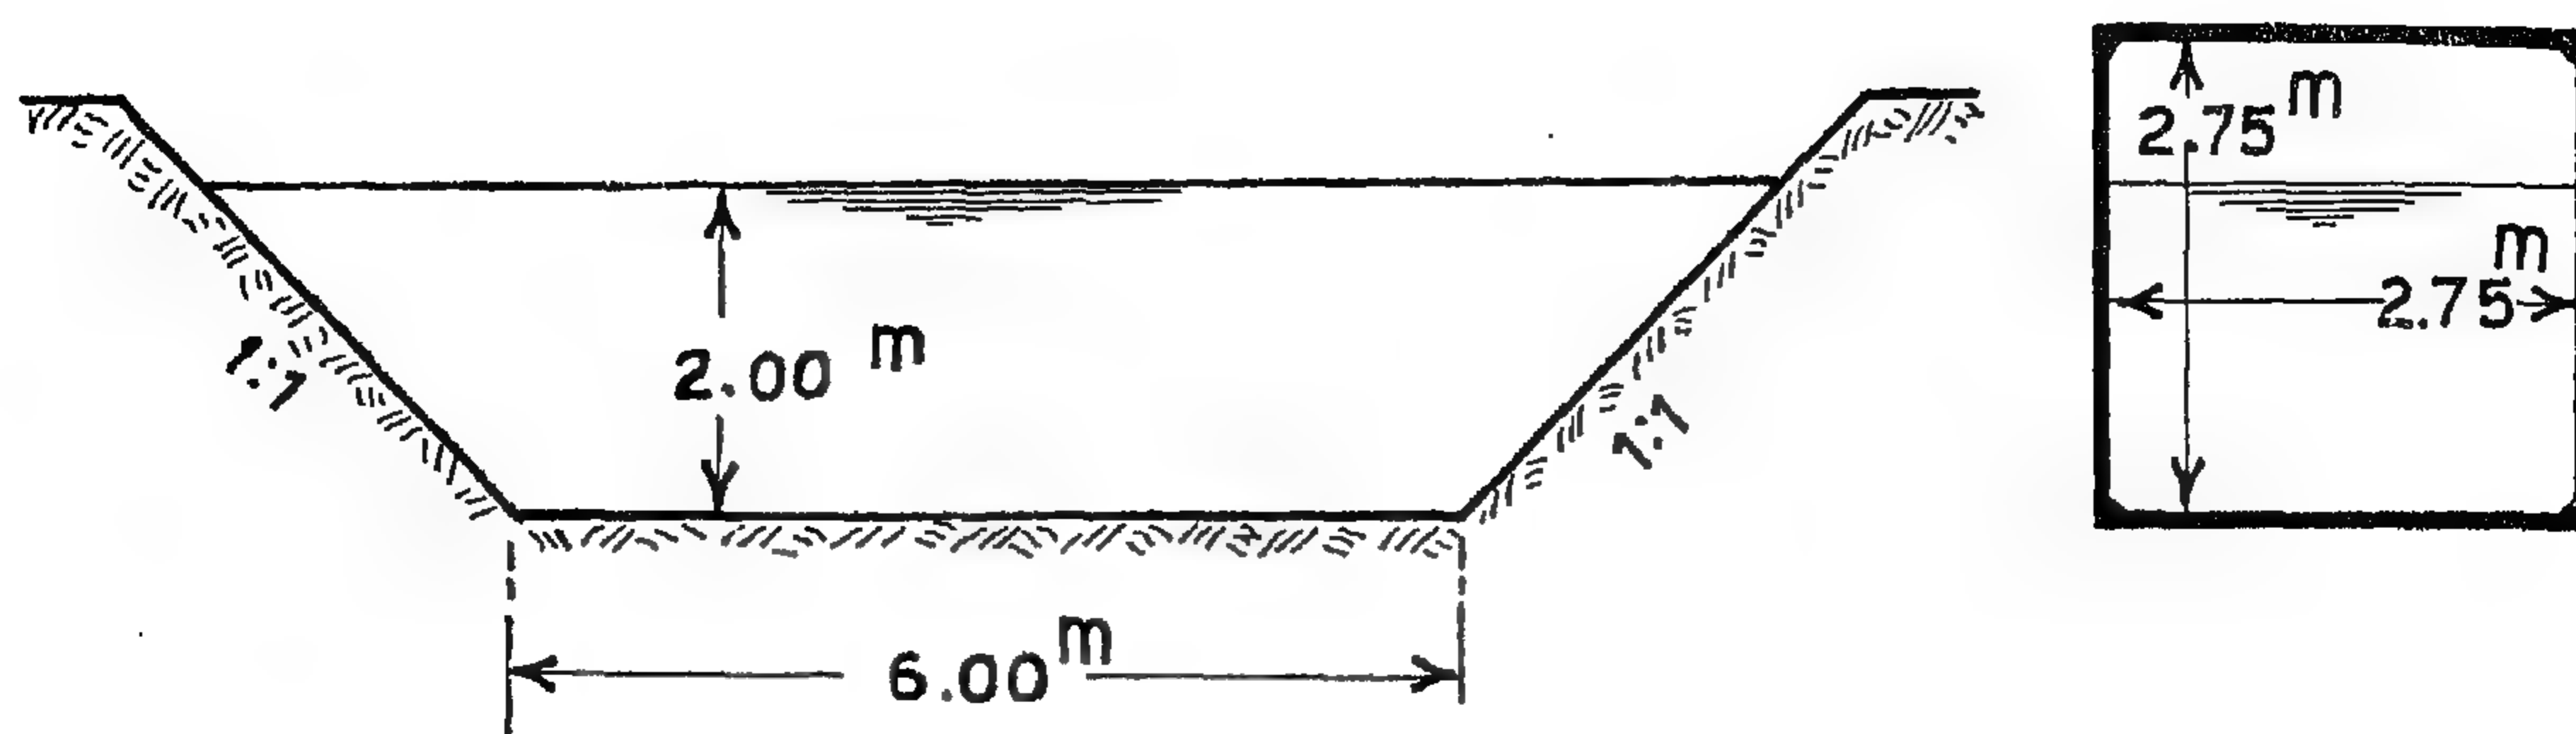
CHANNEL AND CULVERT SECTIONS AS PROPOSED IN THE ILLUSTRATIVE EXAMPLE
